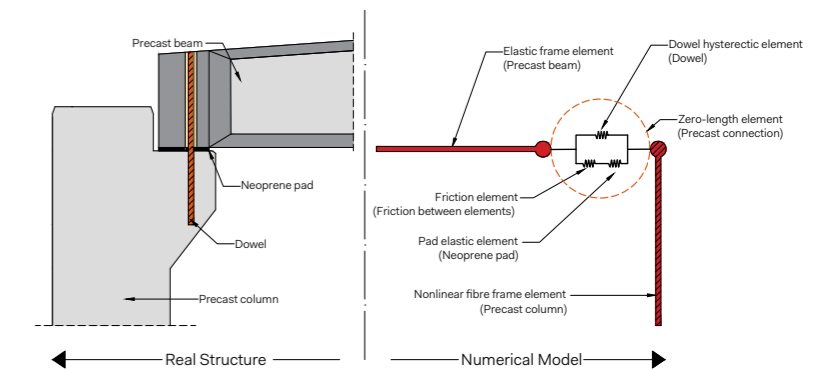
· Beam-to-column connections in conventional PRC buildings: common configuration (left) and numerical arrangement adopted (right)
